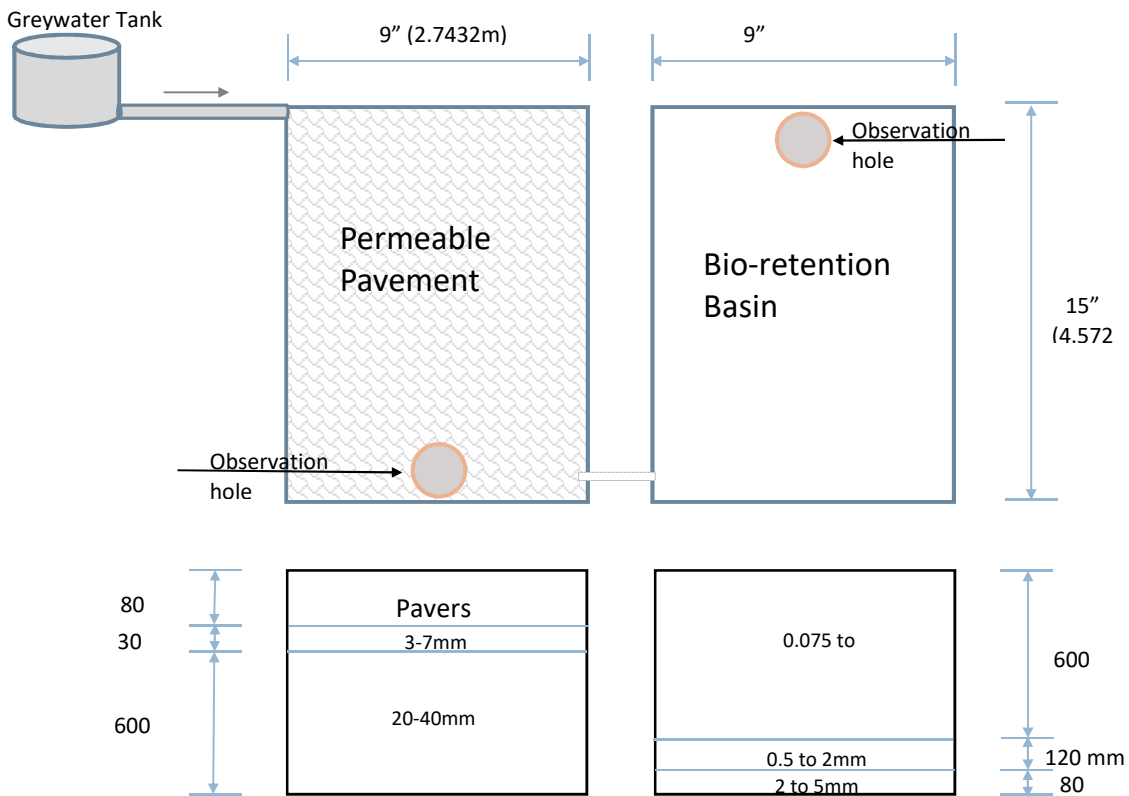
Layout of permeable pavement and bioretention basin constructed on the Falaz Hazza campus of the UAE University
